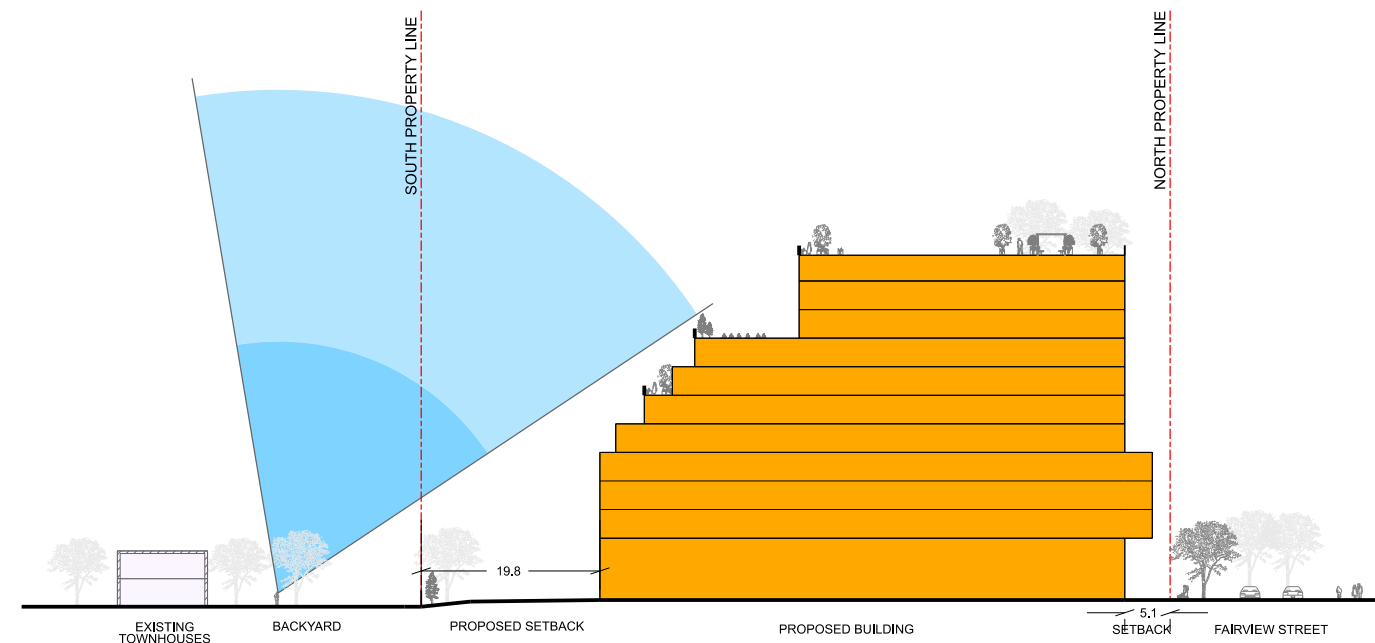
Cross-Section illustrating the Building Setback From the Existing Townhouse Property to the South and Extent of Skyview
